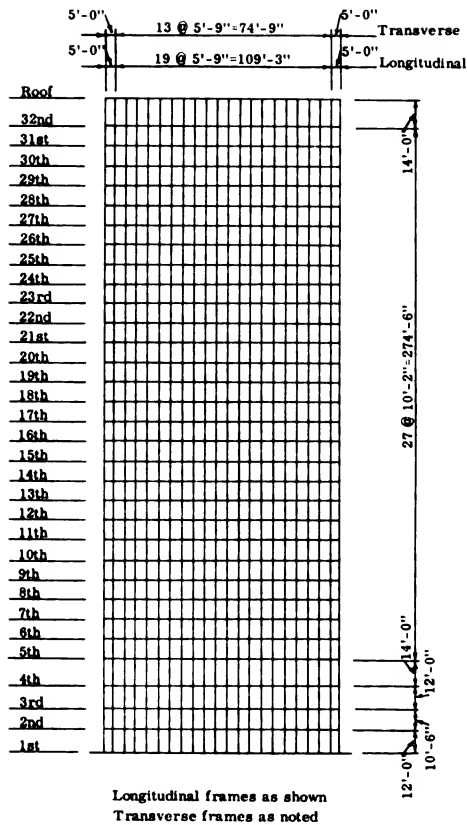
Bunker Hill Tower. Elevations of exterior frames.
